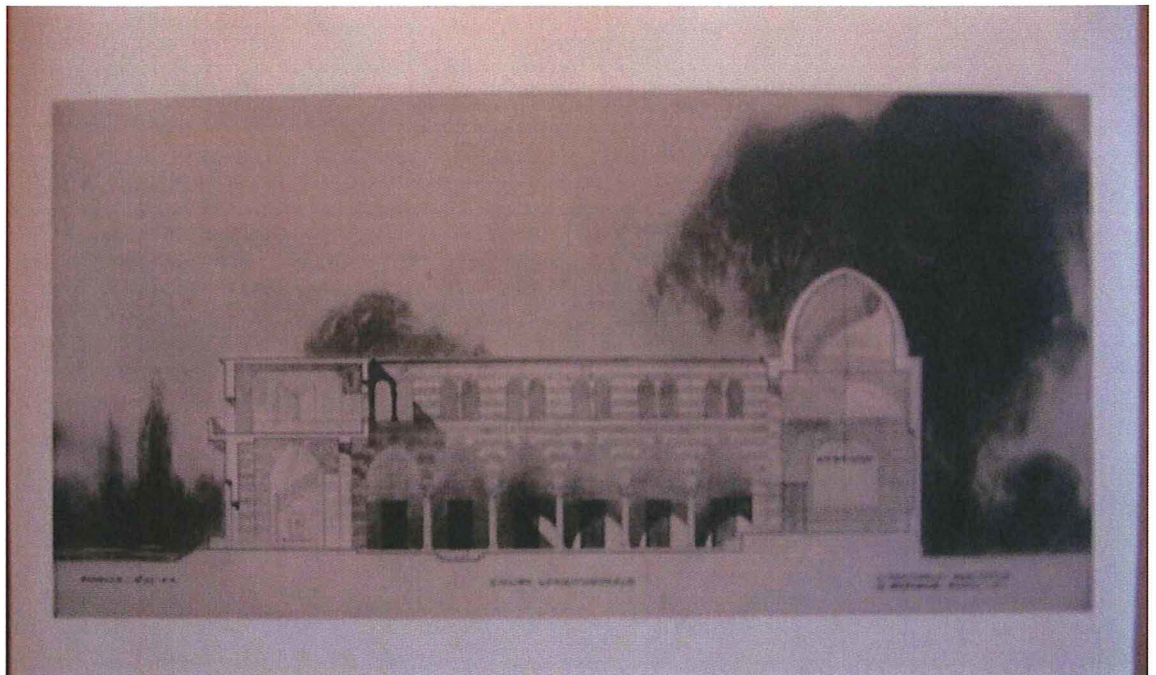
Syrian pavilion. Side elevation. (MAE, CAD)
